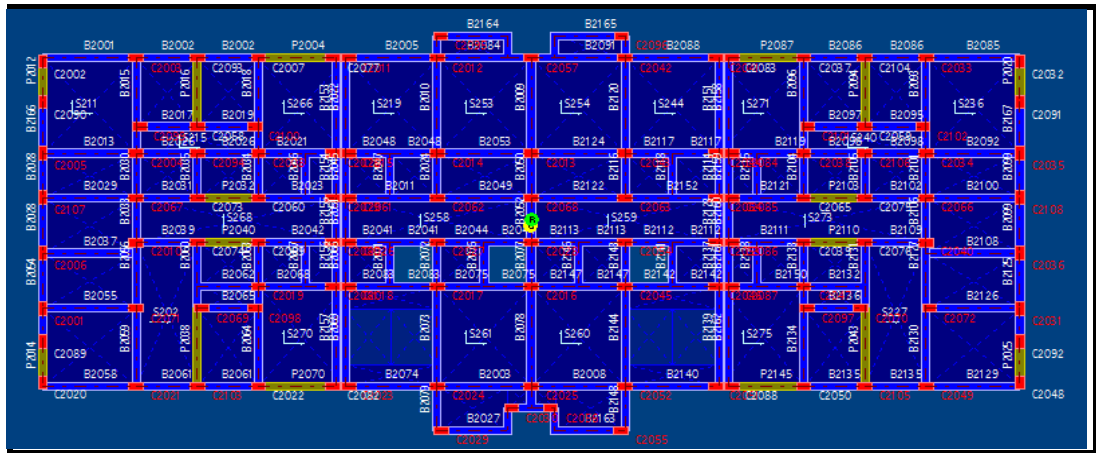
Plan of Twenty Five Stories and Shear Wall System
